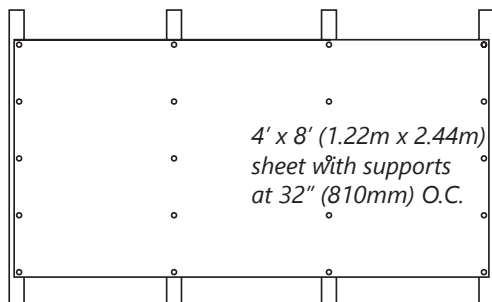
Figure F - Typical ResinDek Xspan & Xspan FR Channel/Beam Installation
